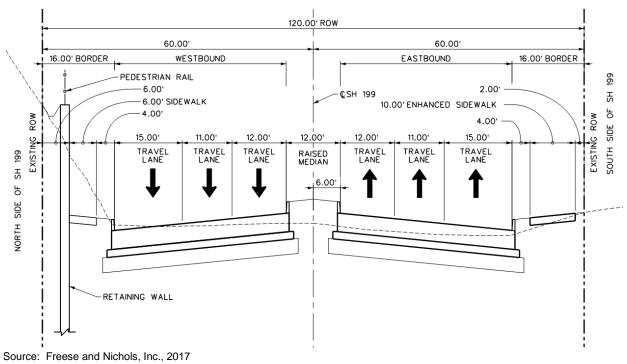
Recommended Typical Section from Extension of 16th Street to University Drive/Northside Drive
